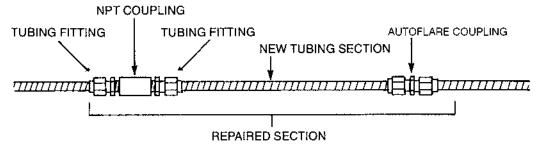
Repair of Damaged Tubing with a New Section of Tubing and a joint splice or a TracPipe® CounterStrike® AutoFlare® or AutoSnap® Coupling
